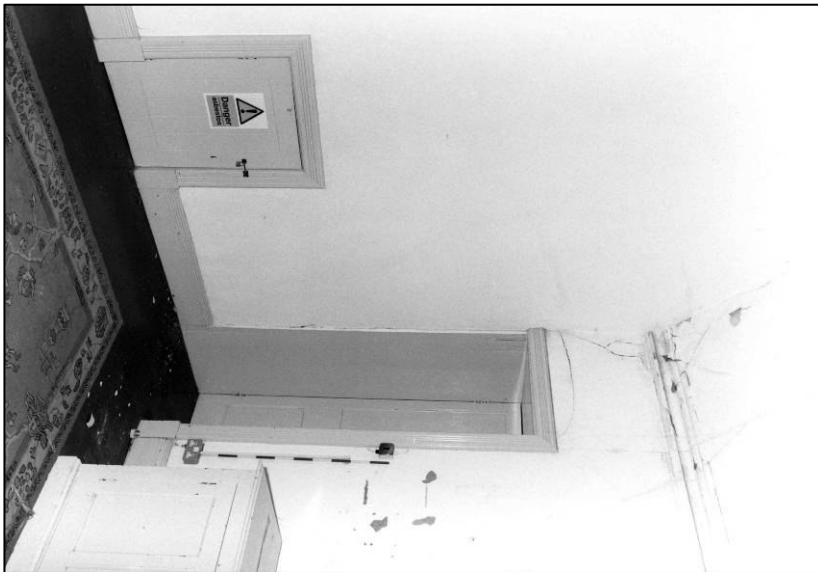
Church: west vestry, looking SE (photo 9/12) (top to right).
